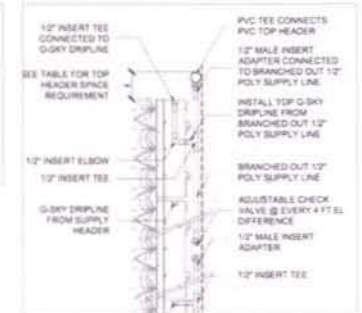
BRANCHED OUT 1/2" POLY SUPPLY LINE / LINE ENDS PLAN SECTION
